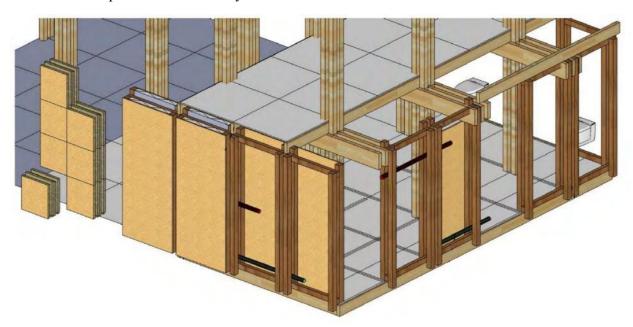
BRIC - prefabricated boxes assembled with dry connected
